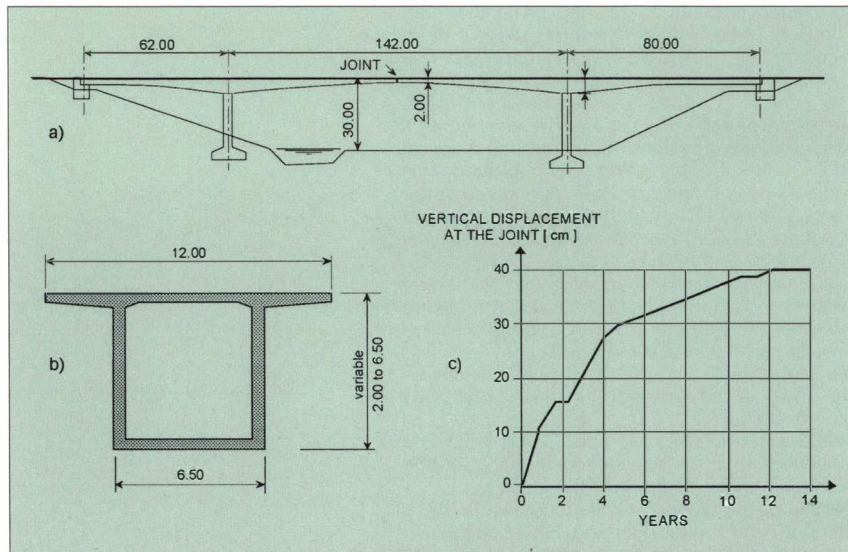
Rehabilitation of a prestressed cantilever bridge :
